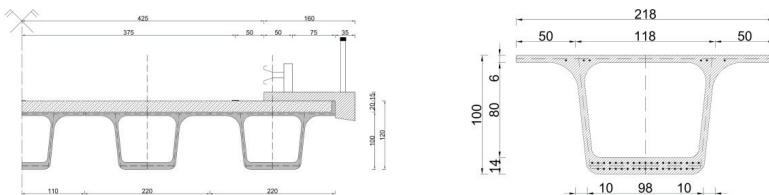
Possible bridge construction made of several UHPC box girder (left) and corresponding girder cross section for a bridge span of 30 m (right)
